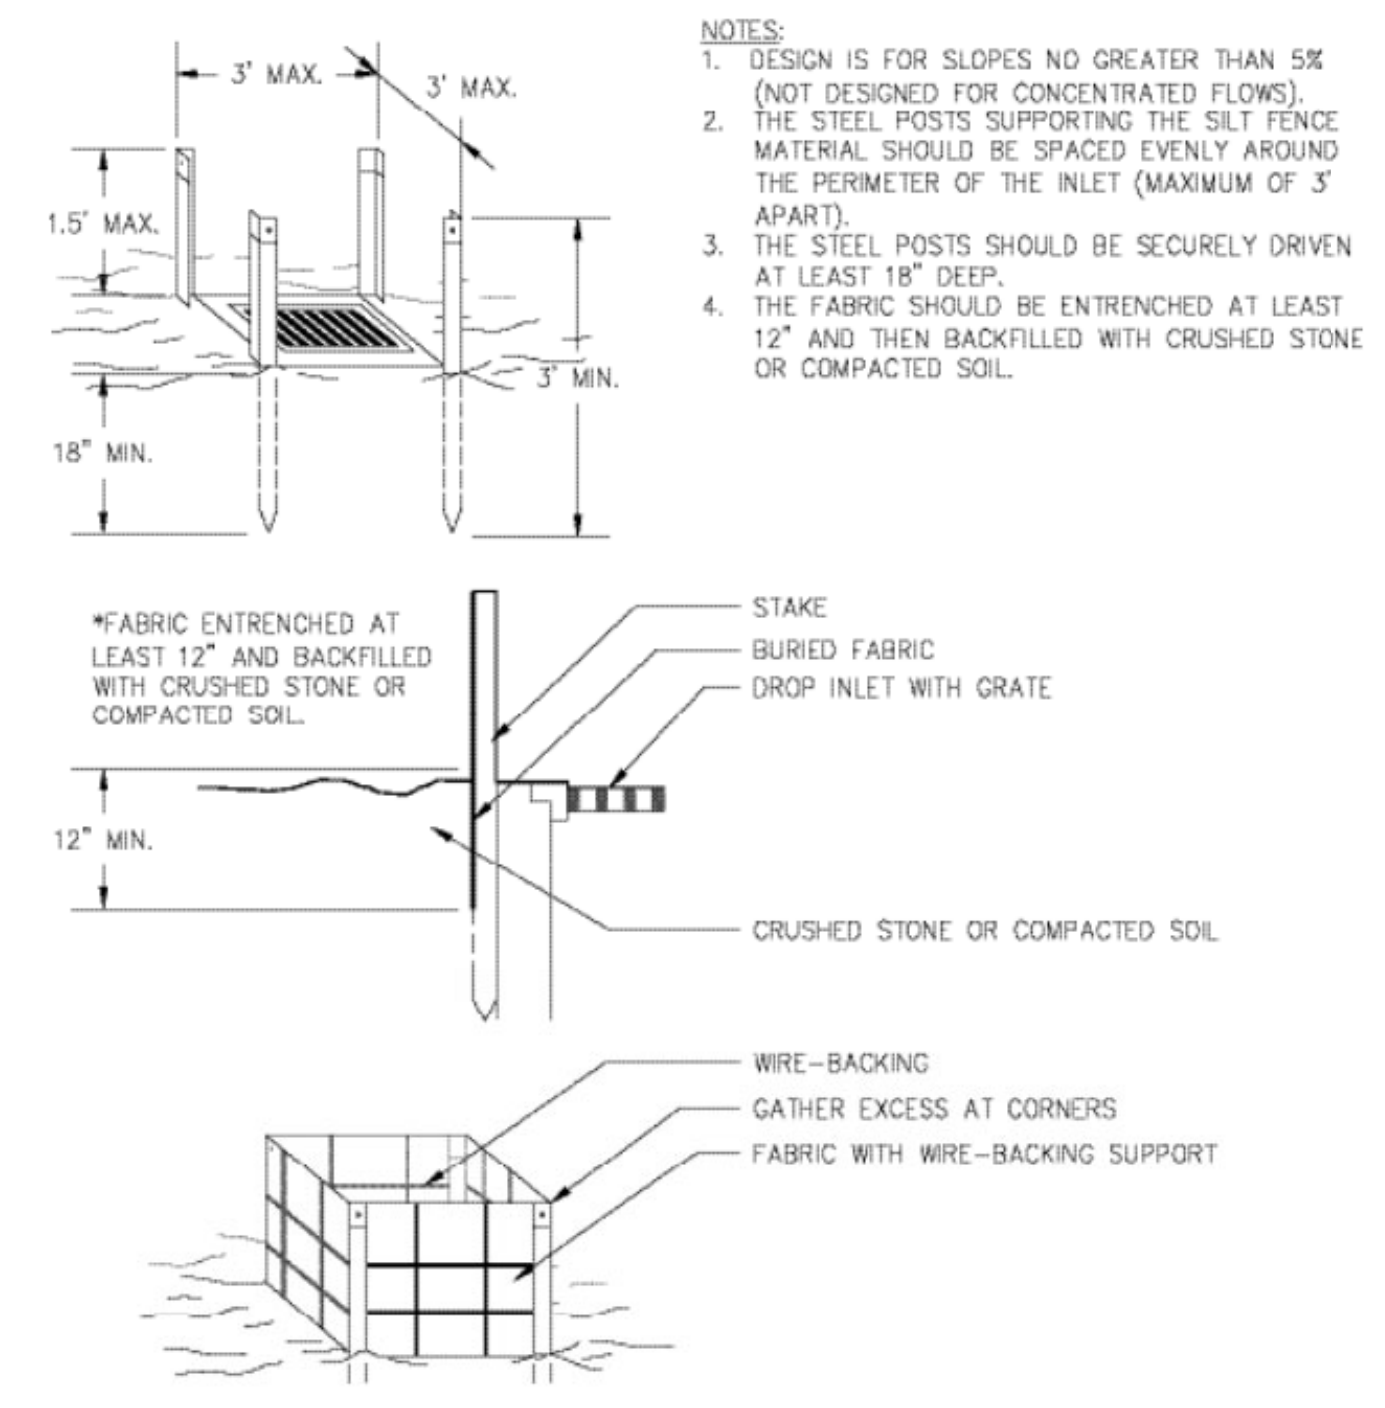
Fabric and Supporting Frame For Inlet Projection
